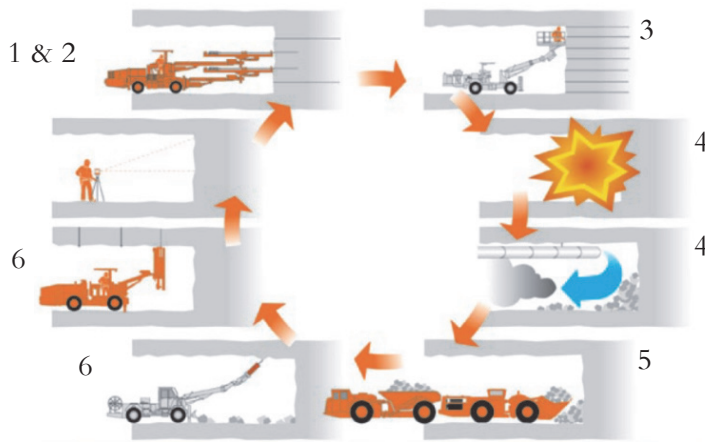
Excavation cycle in tunnel excavation (Modified after Tamrock, 1999).
